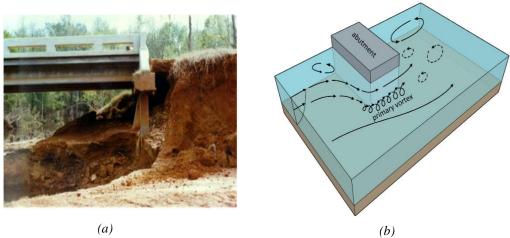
(a) bridge abutment failure caused by scouring (b) schematic figure of scouring pattern around bridge abutment
